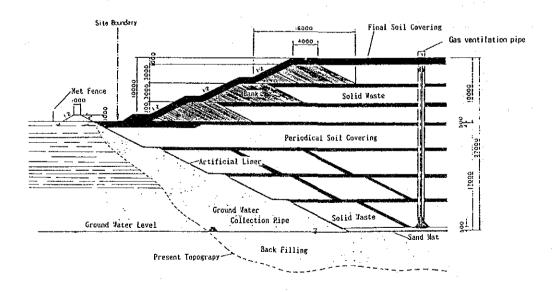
Typical Cross Section of the Sanitary Landfill in Ram Intra
